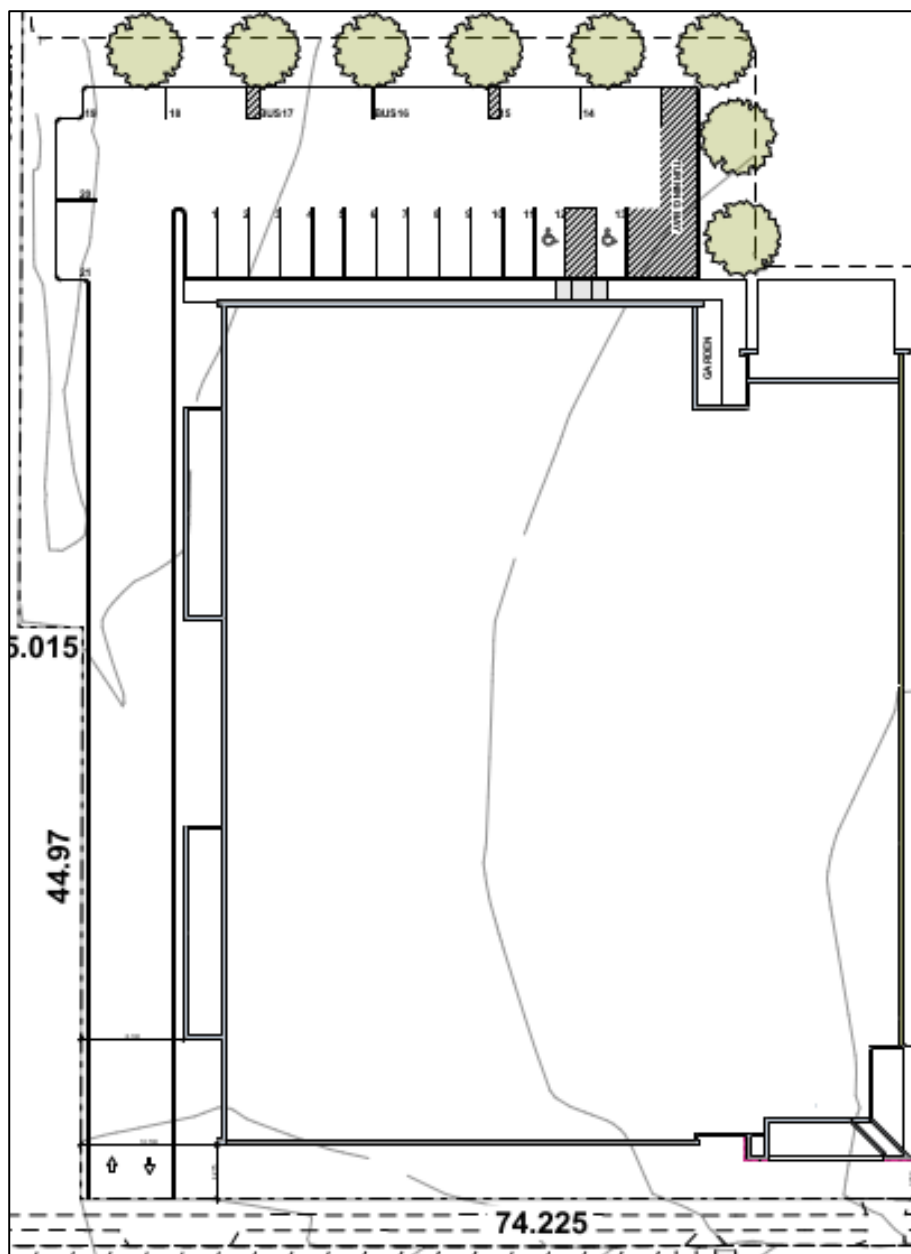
PCYC Facility (Proposed S4.55(2) Modification Driveway and At-Grade Carpark Plan)
